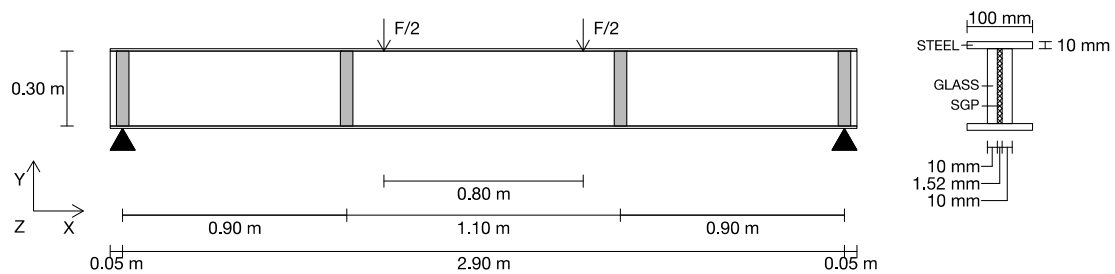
Test setup and reference geometry for the tested full-scale hybrid beams (front-view and transversal cross-section).
